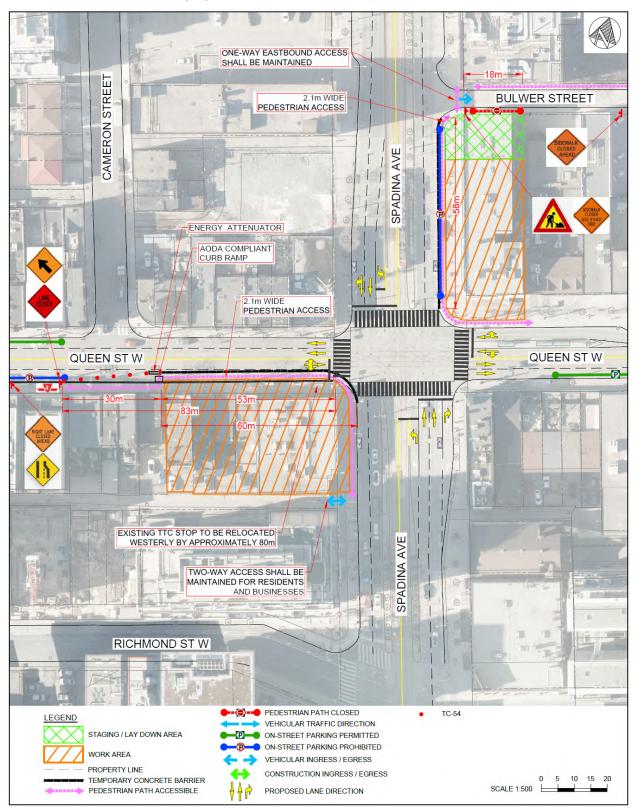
Spadina Avenue / Queen Street - Traffic Staging Plan
